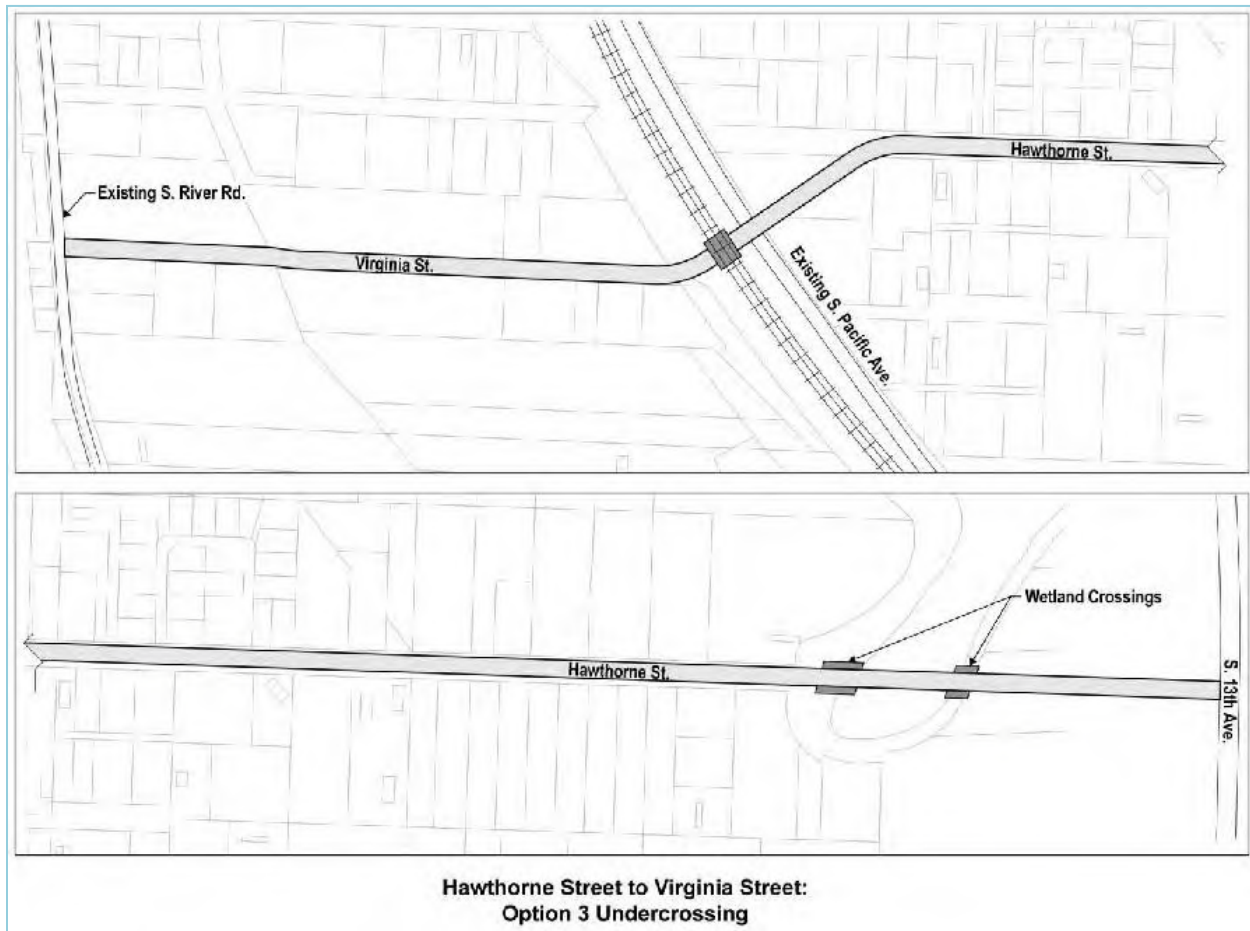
Option 3: Hawthorne Street to Virginia Street Undercrossing
